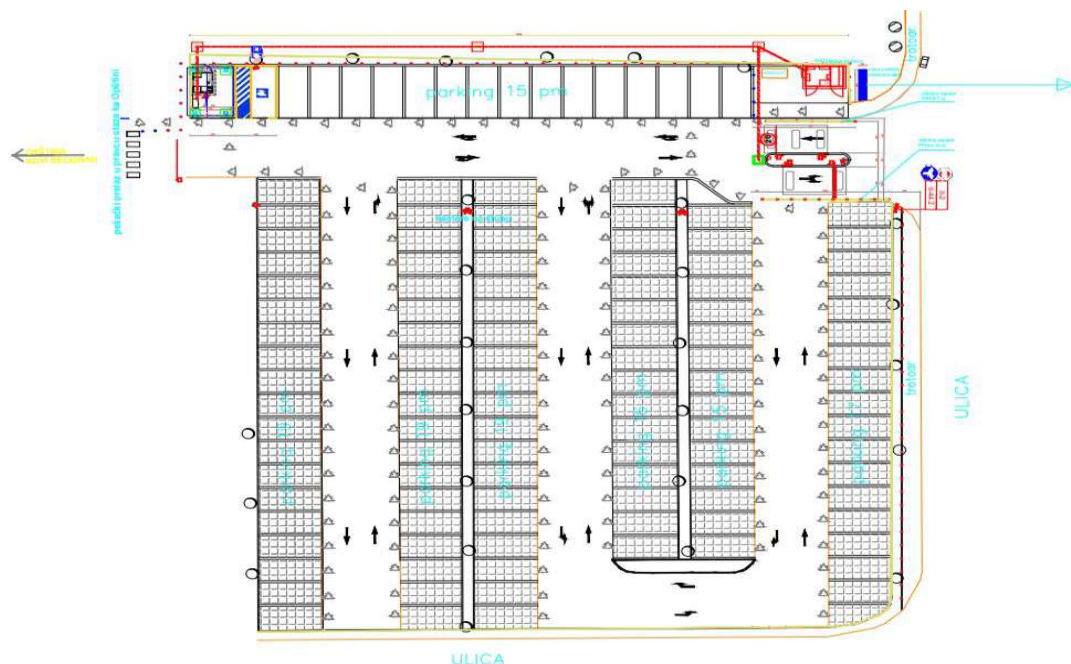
Sketch of the constructed project of parking lot “Novi Beograd”. Source (Biljana Vlajić "Parking servis" Beograd, 2024)
